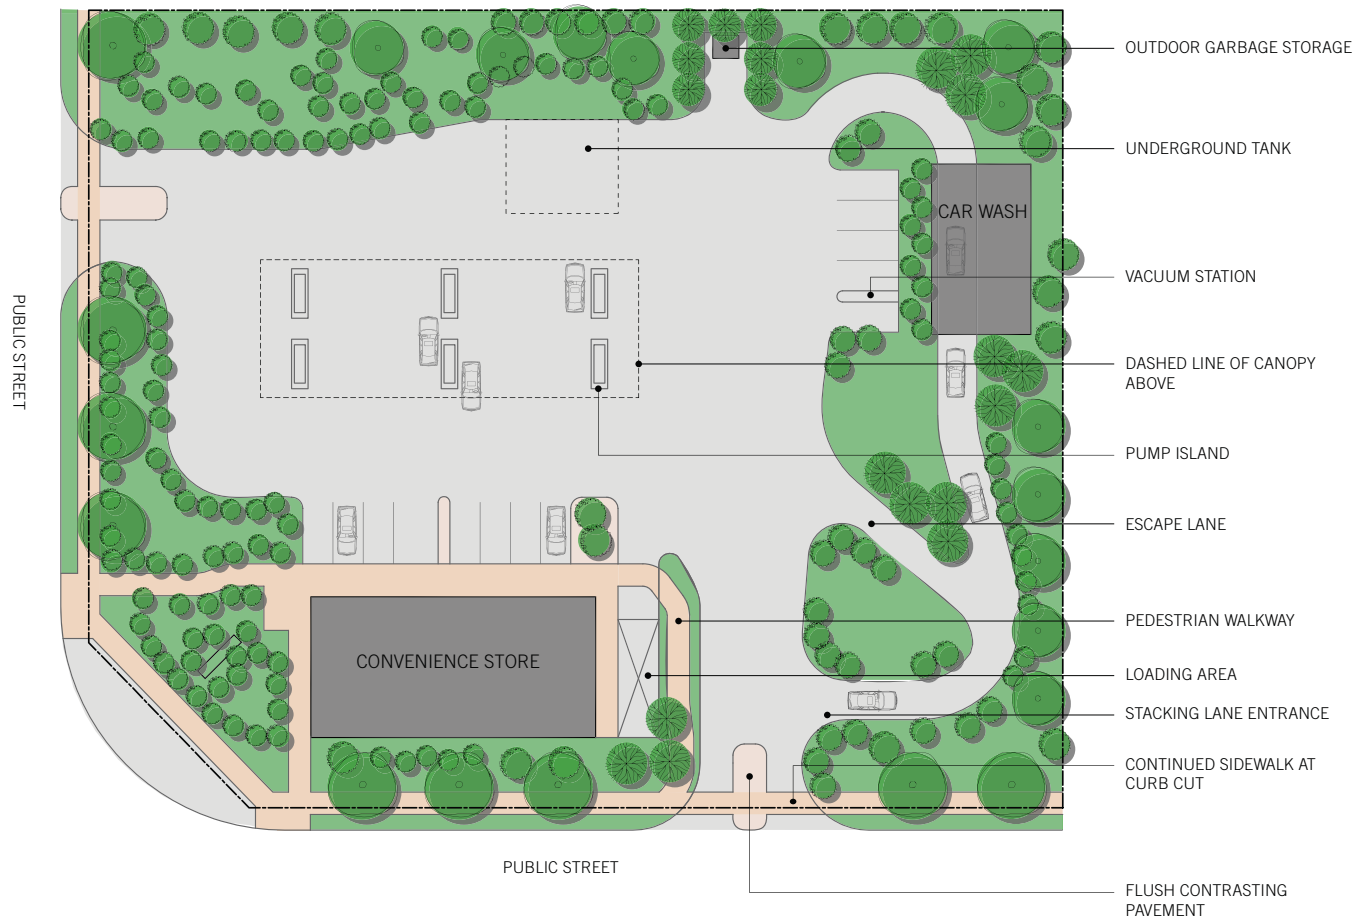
Gas Station Site Plan adapted from the City of Ottawa Planning and Growth Management Department: This site plan illustrates opportunities for a more urban gas station site plan where the convenience store addresses the street edge, landscape treatments screen vehicular areas and the car wash is located at the rear of the site.
